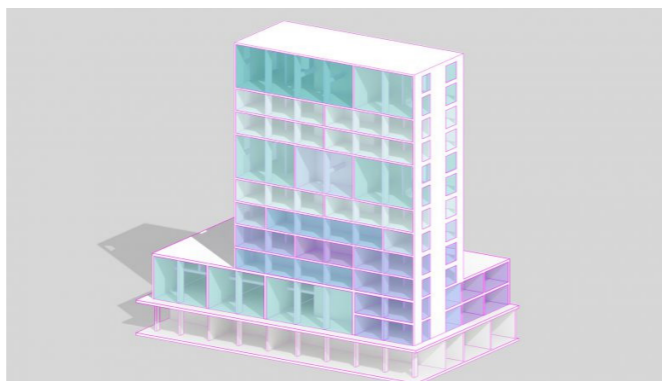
Building Facade. Source: <https://olafgipsen.com/projects/residential-building-bsh/#2>
